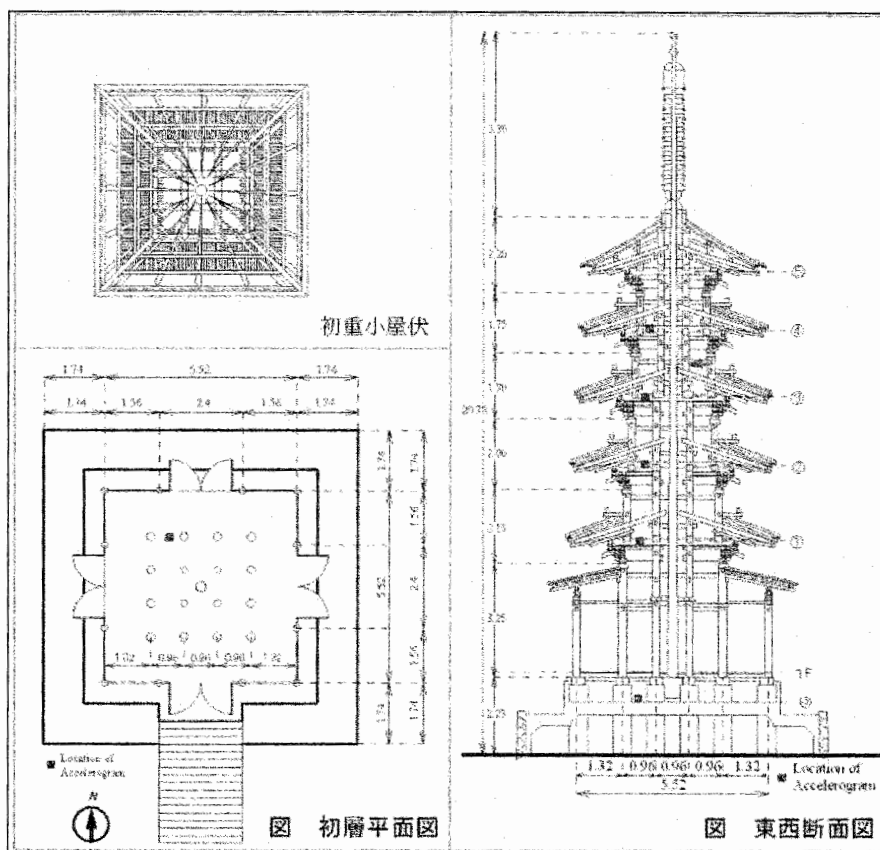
Plan and Elevation of Tsu Kanon Pagoda
